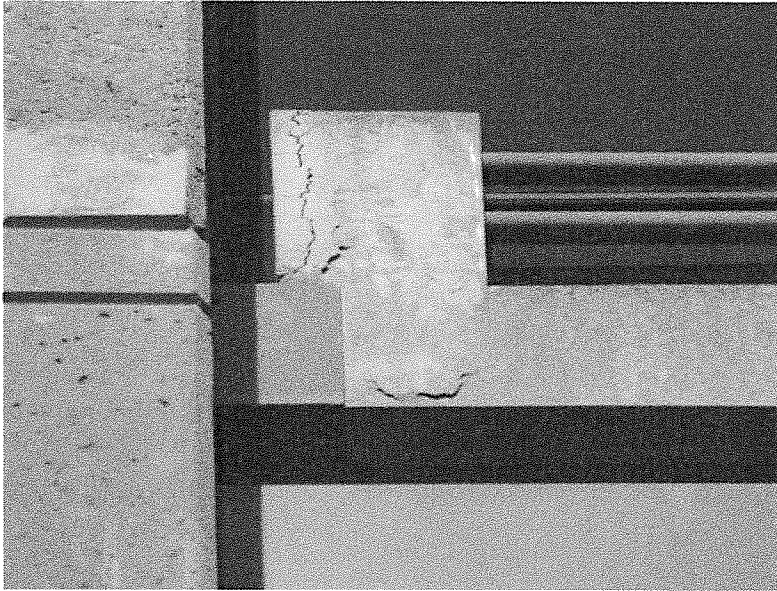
Incipient spalls on concrete balcony rail at east facade, tenth floor
